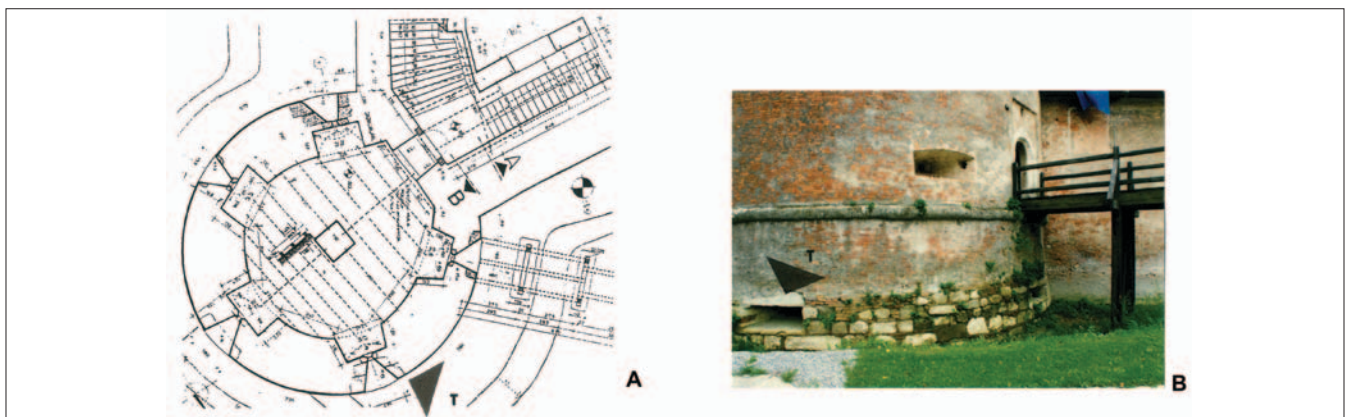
Kaštel Sisak: A – layout of the battery gatehouse (ground-floor) with five openings for cannons (drawing by: V. Bartoniček, Croatian Conservation Institute); B – detail of a tower next to the entrance (photo by: Z. Horvat)
